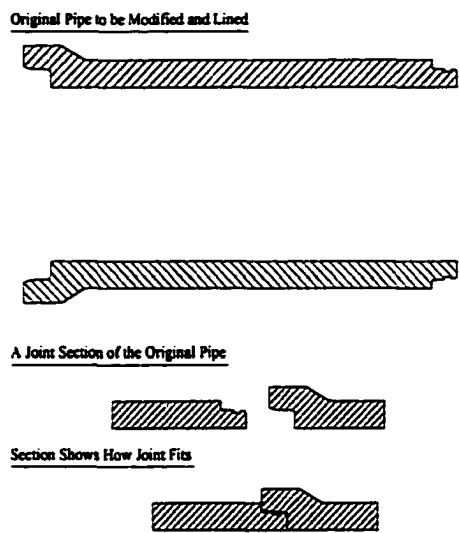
General geometry of the pipe and joint to be modified (Iowa Concrete Products, 1998)
